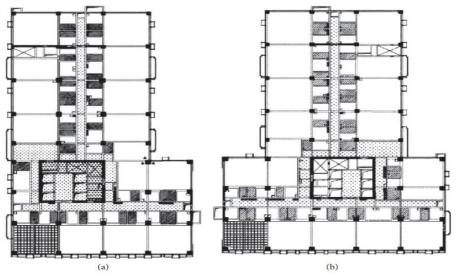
Optimal Layout of standard floor structure of the tower above isolation floor(a) Tower B (b) Tower A
